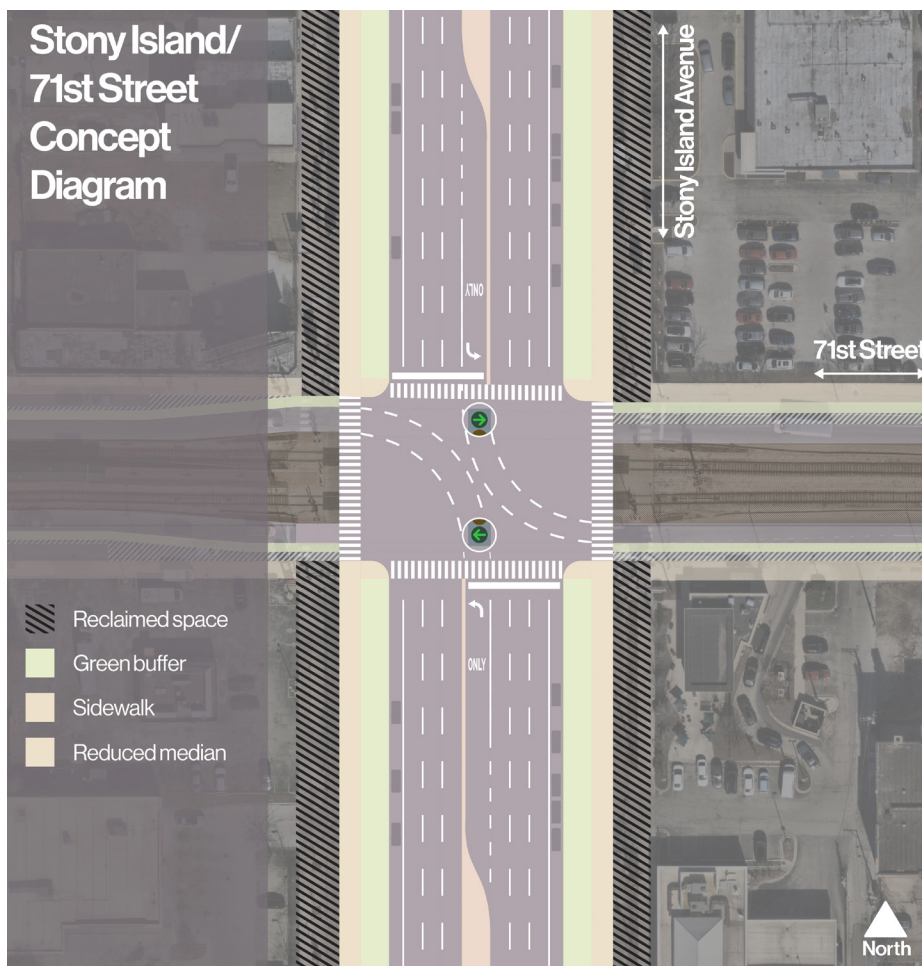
Concept diagram illustrating addition of left-turn lanes from Stony Island Avenue to 71st Street
